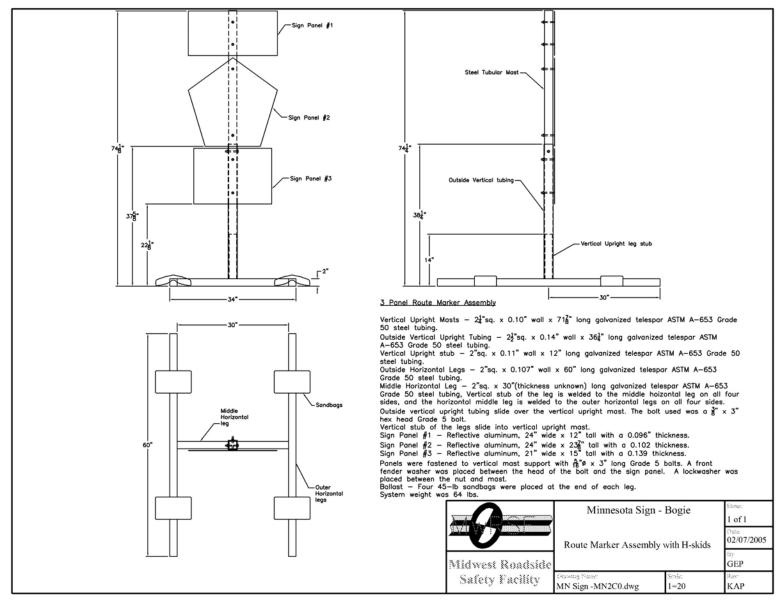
Route Marker Assembly System Design Details, Bogie Test MN2C-0
